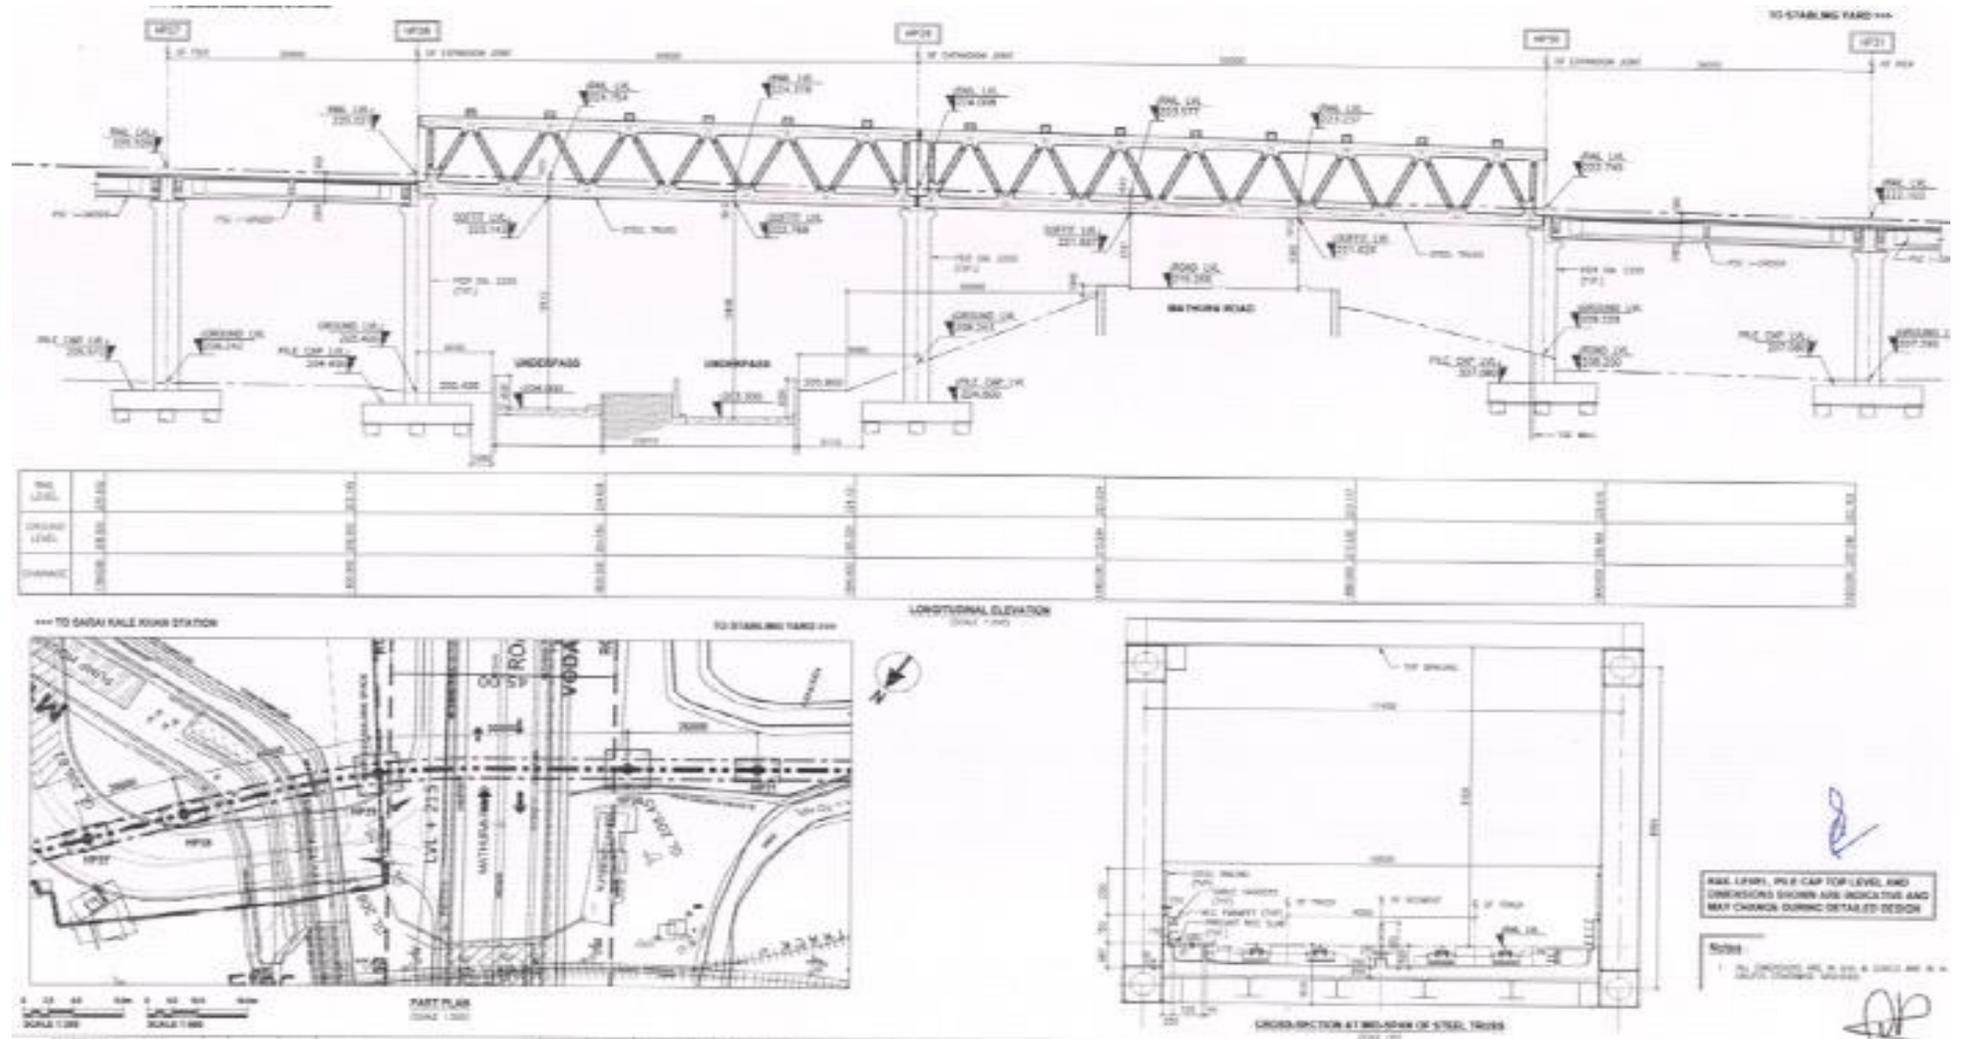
General Arrangement of Obligatory Crossings over Barapulla Flyover (Stabling Yard alignment)
